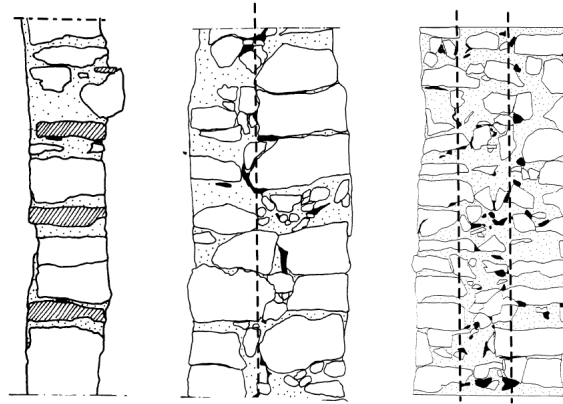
Typical stone masonry sections: one, two, and three leaves [Binda et al. \(1999\)](#).
